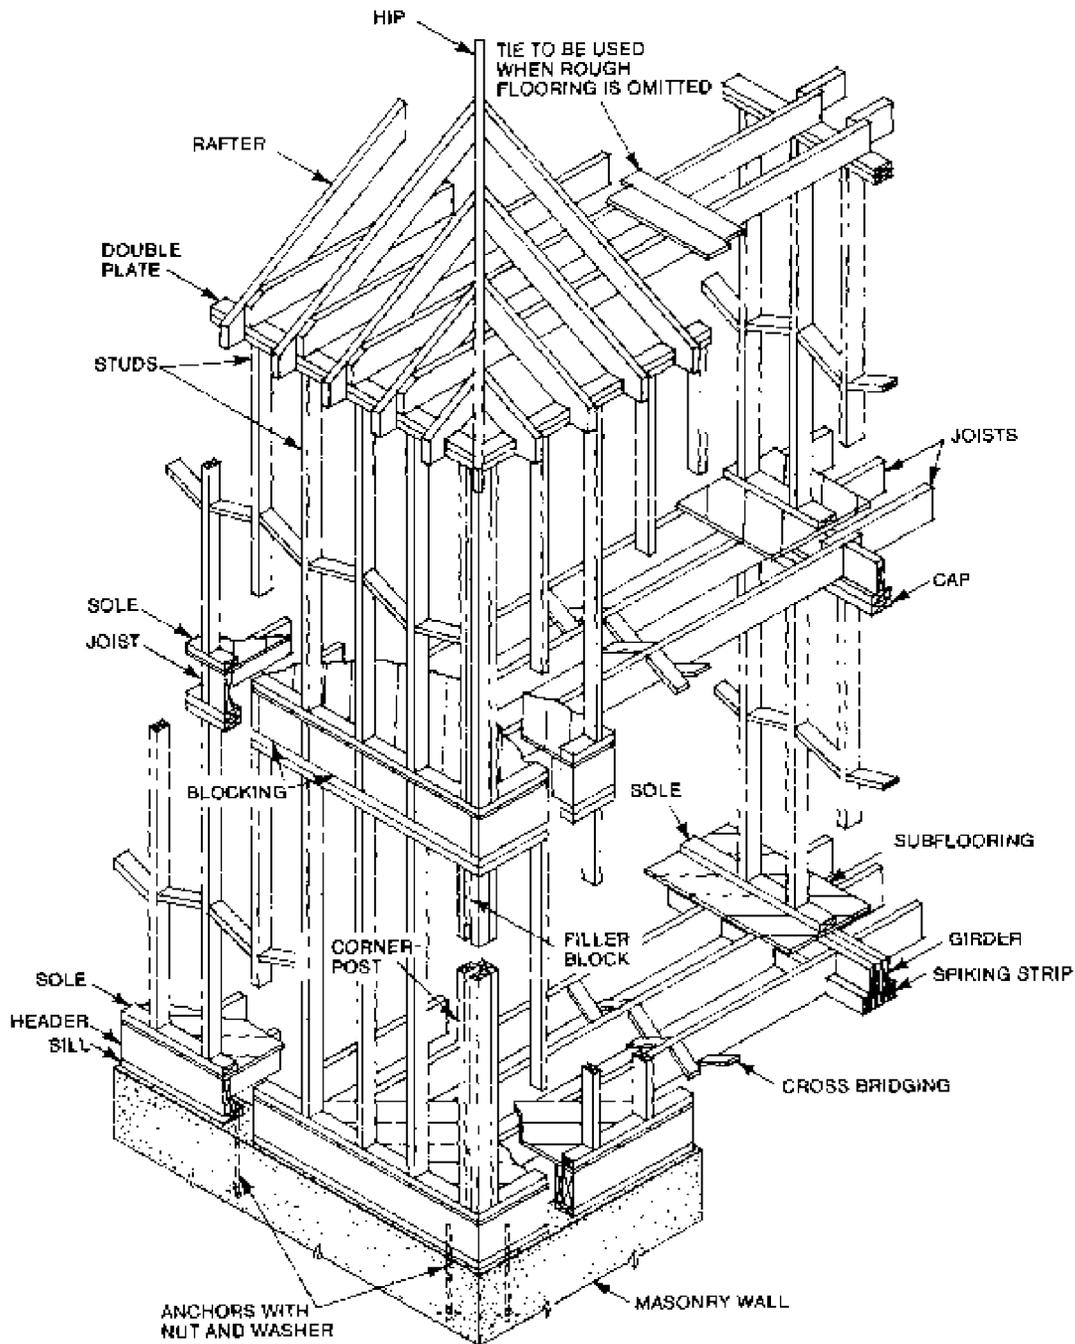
PLATFORM (or WESTERN) FRAMING.
